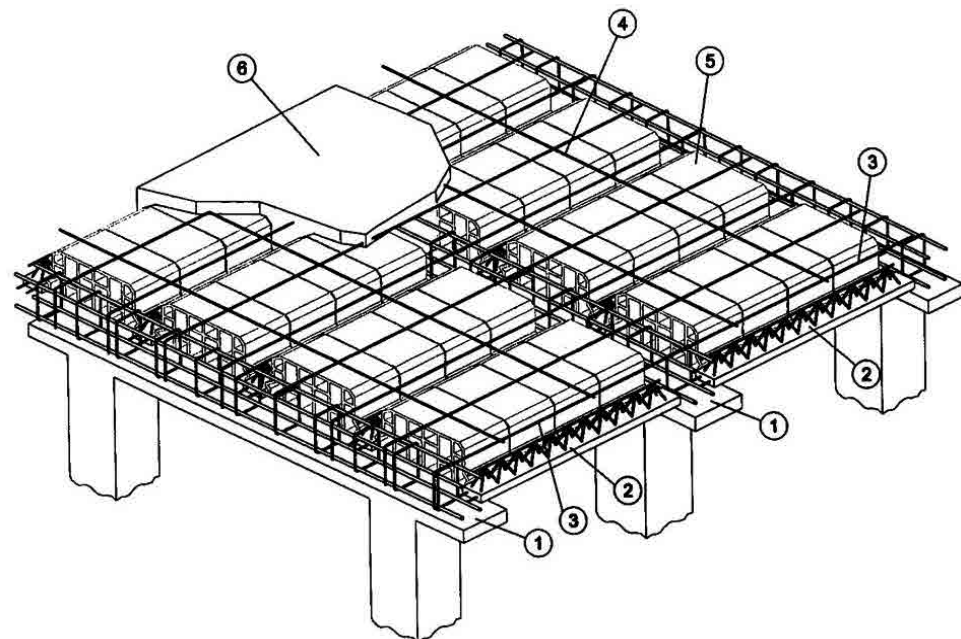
Typical one way spanning slab – joists with basal reinforcement (grid layout). Design by Susana Mora.
